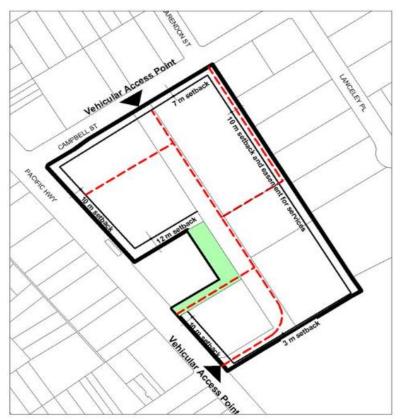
Extract from WDCP-Gore Hill Technology Park, Indicative access routes, open space areas and building setbacks
